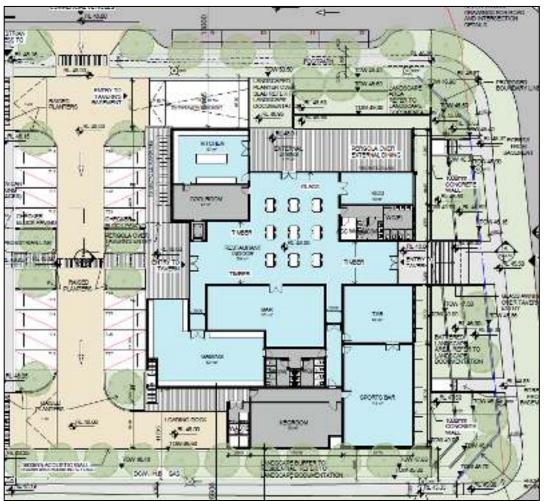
Tavern Floor Plan (Source: Marchese Partners, Ref: DA2.03, Rev R dated 14/10/2020)
